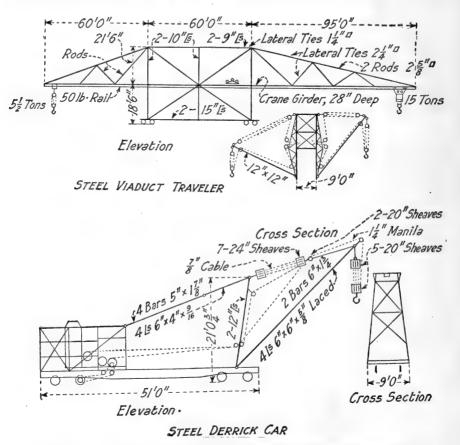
DETAILS OF A VIADUCT TRAVELER AND A STEEL DERRICK CAR.
